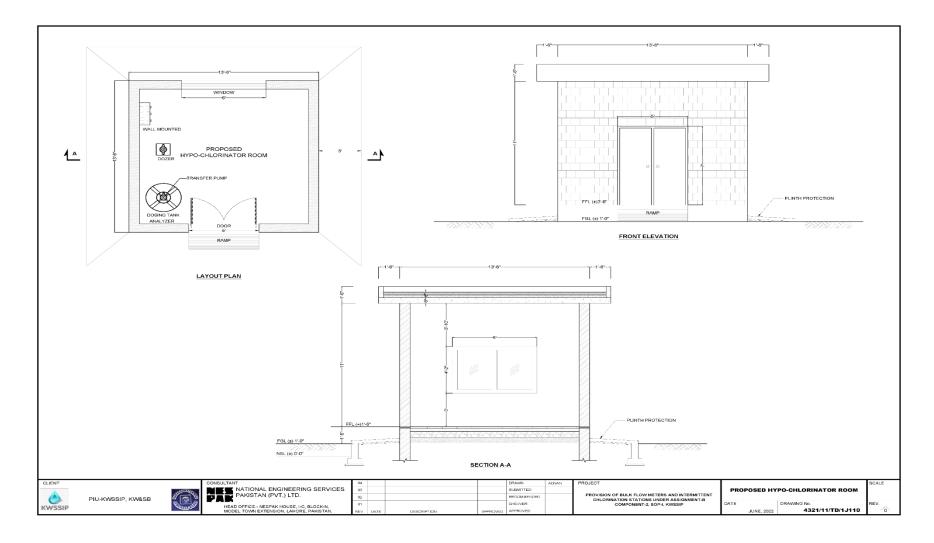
1: Typical Masonry Room for Hypo-Chlorinator System
